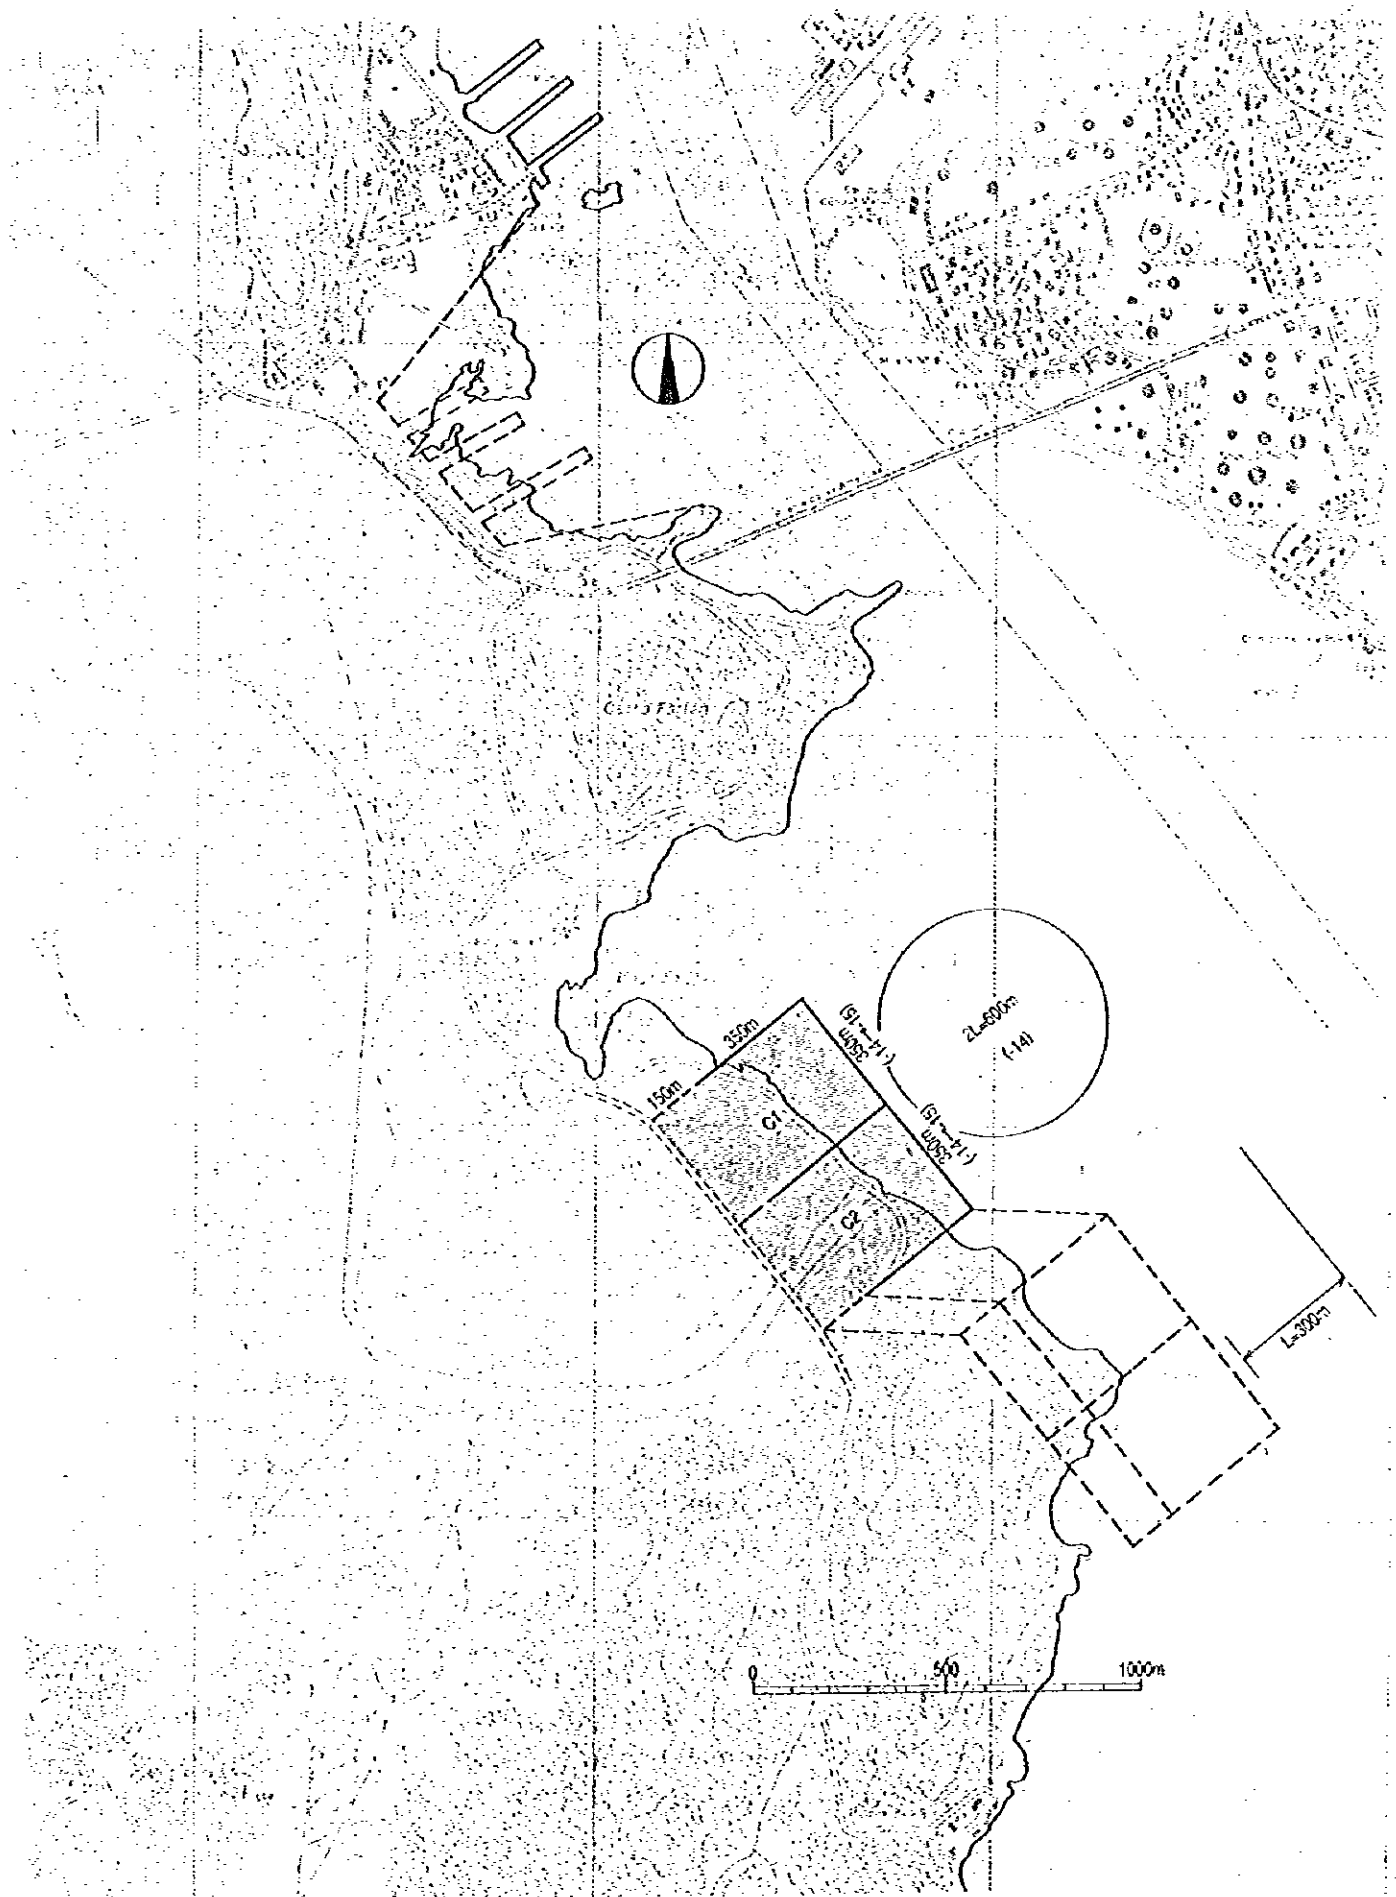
Surrounding Area of New Container Terminal at Farfan
